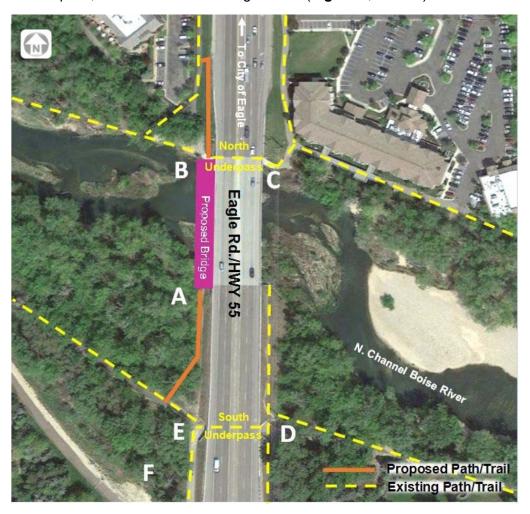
Bridge Plan View (existing path with reference Points A, B, C, D, E and F)
